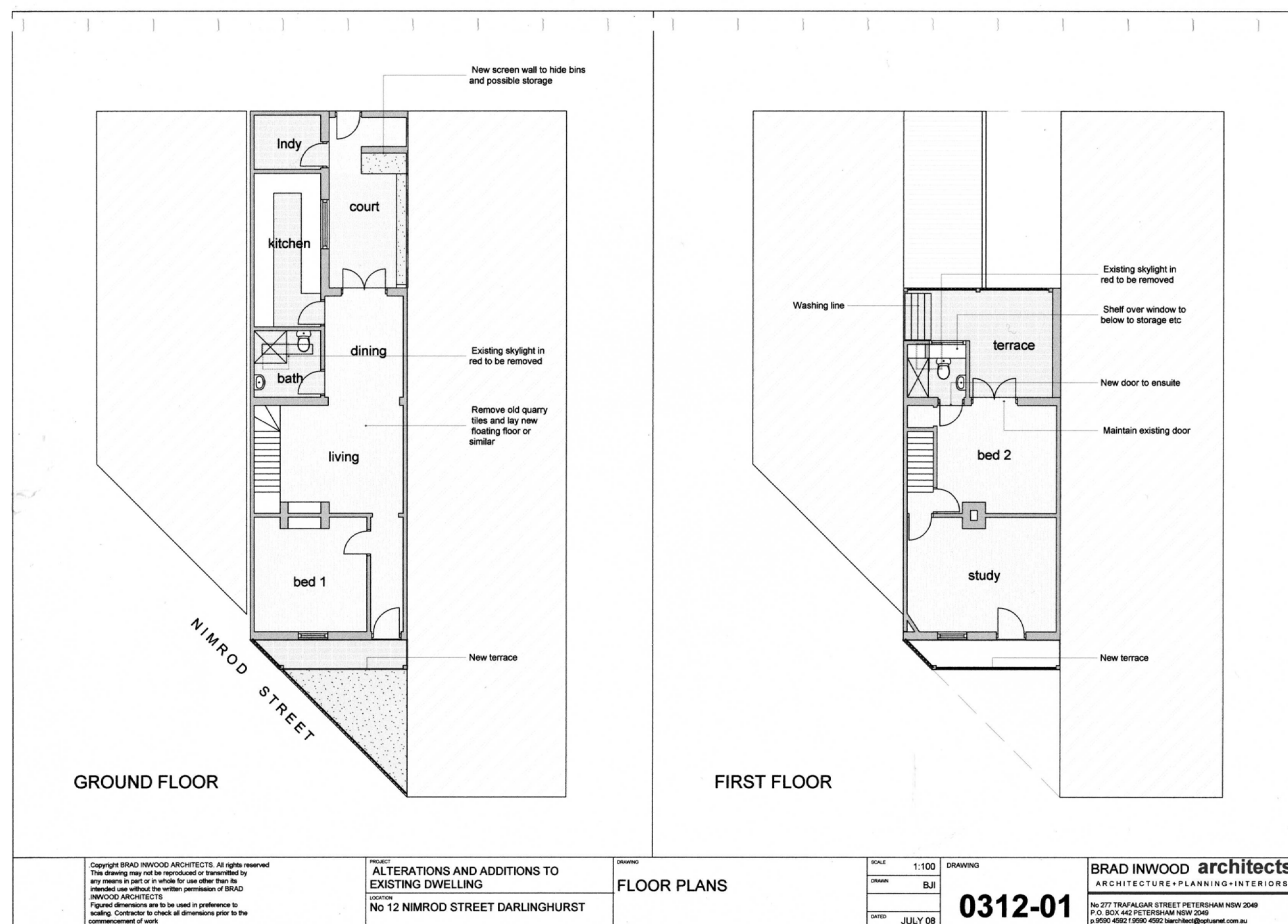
2008. 12 Nimrod Street proposed floor plans.
